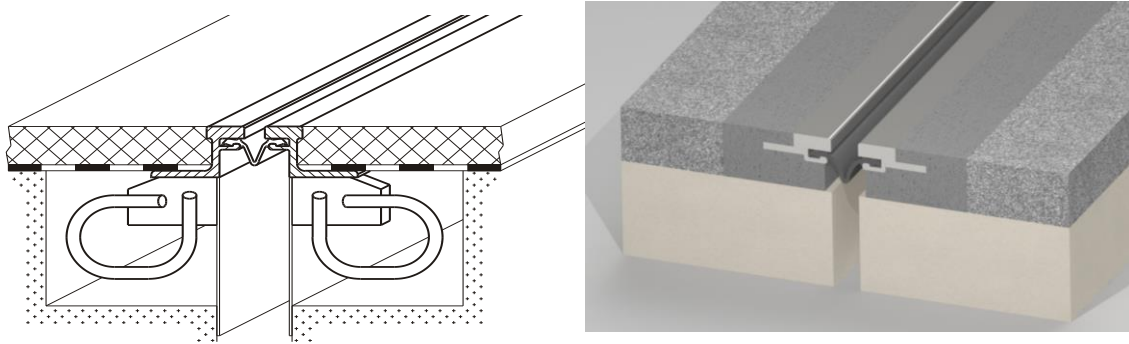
Single gap joints of two types: a Tensa-Grip joint with normal concrete connection (left), and a Tensa-Crete joint with polymer concrete anchorage – ideal for use on existing structures (right)
